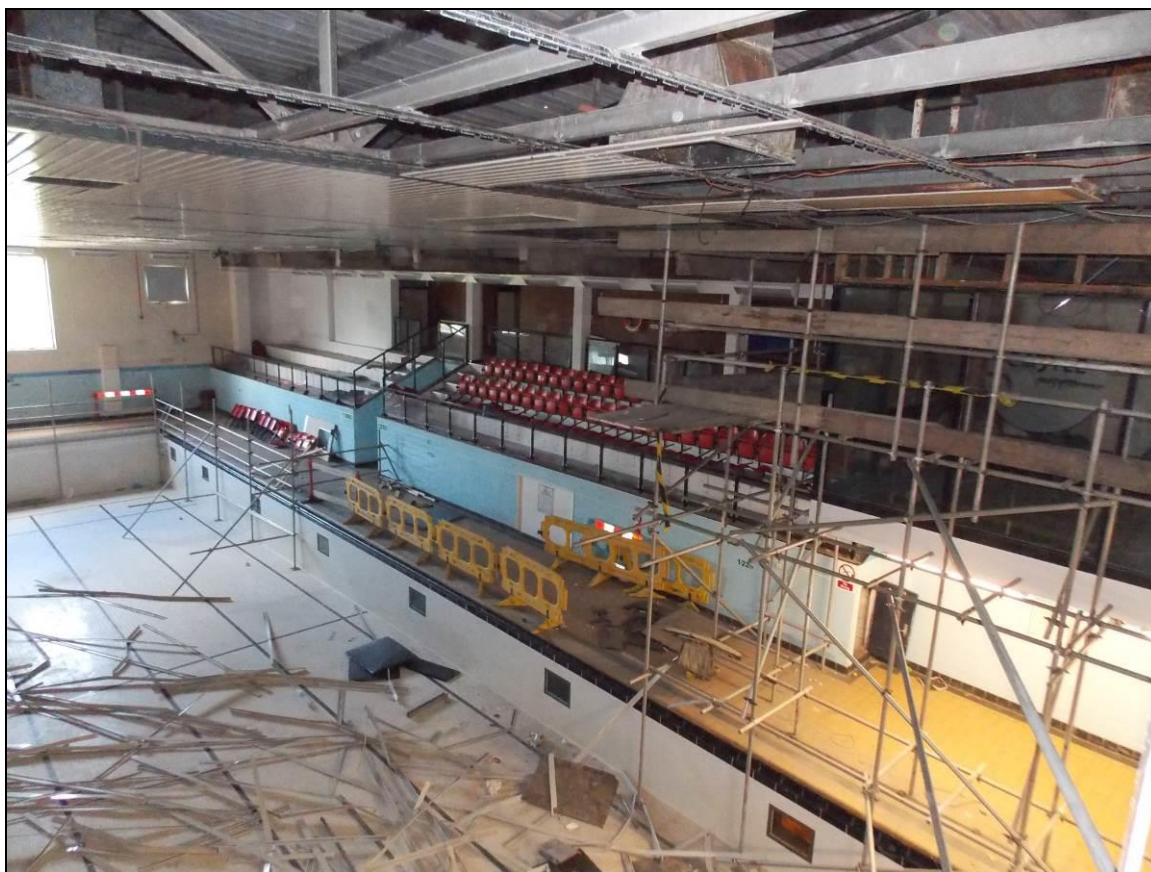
First floor area along the norther side of the large pool, looking north-west (scale 2m).
